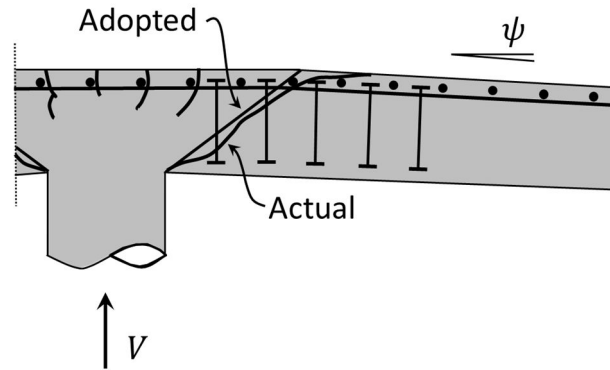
Structural Models after Bending Cracks Develop with Subsequent Crack Propagation (Muttoni and et al, 1991)
